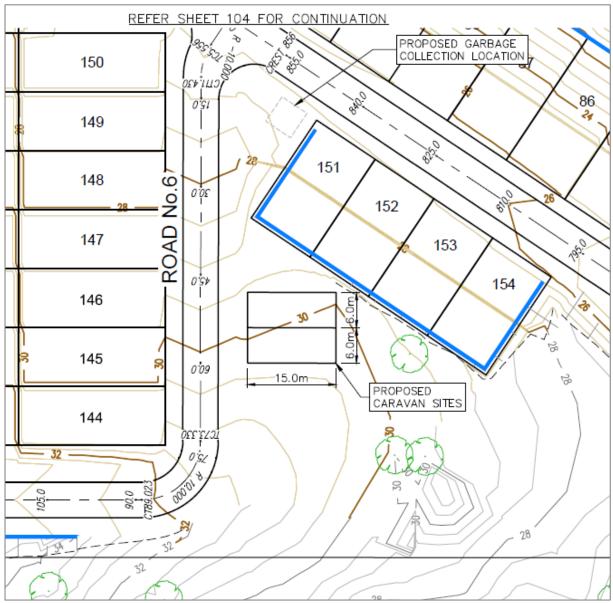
Engineering Plans extract - location of two short term caravan sites
